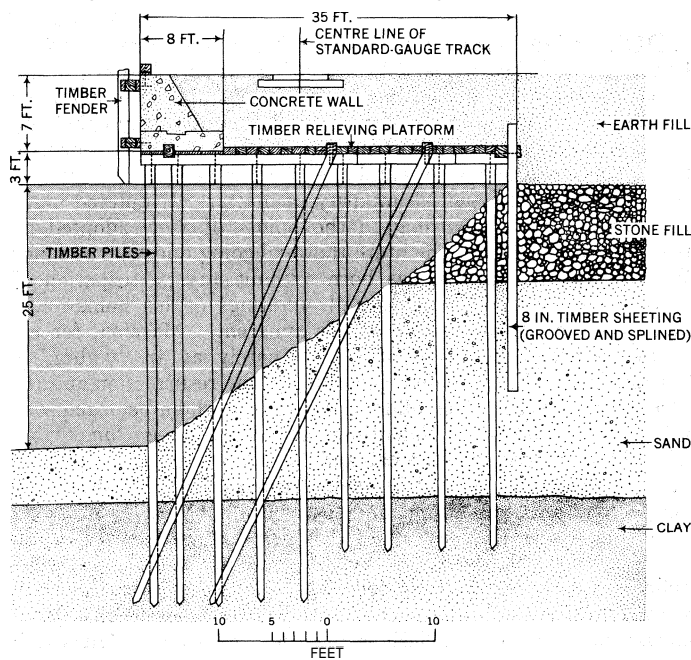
QUAY WALL, SAVANNAH, GA.
